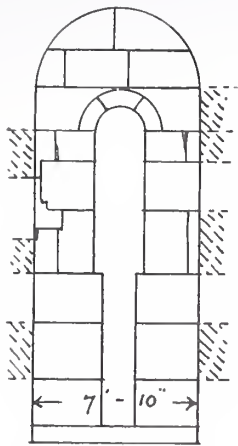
ELEVATION OF NORTH WALL OF NORTH-WEST CHAPEL.
